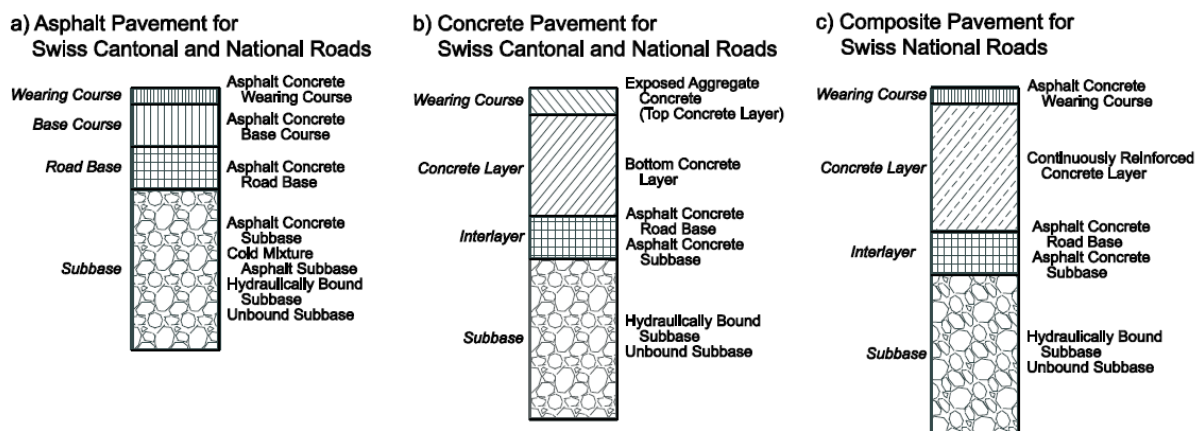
Layer composition of road pavement in *Gschösser* [39]
